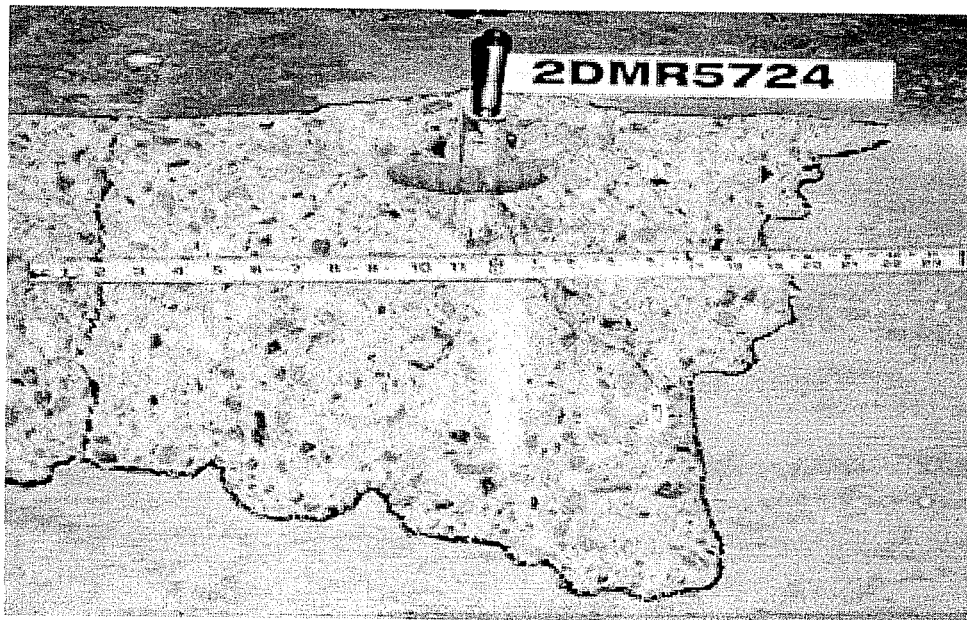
Typical Failure of Undercut Anchor 1 Single-Anchor Connection under Dynamic Shear Loading with a Far Hairpin
